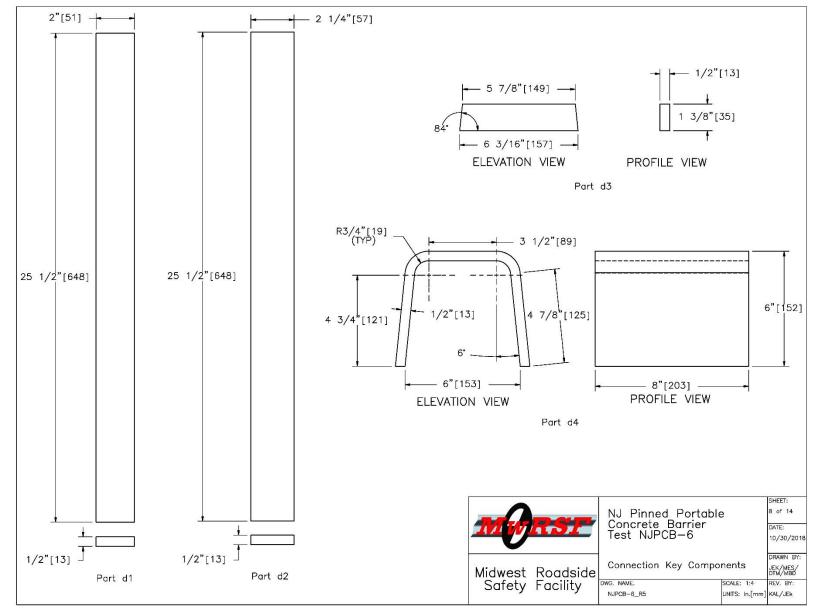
PCB Connection Key Component Details, Test No. NJPCB-6
